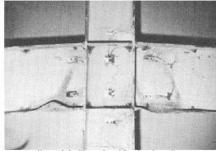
Flange Local Bending Limit State (Beedle, L.S., Christopher, R., 1964)
